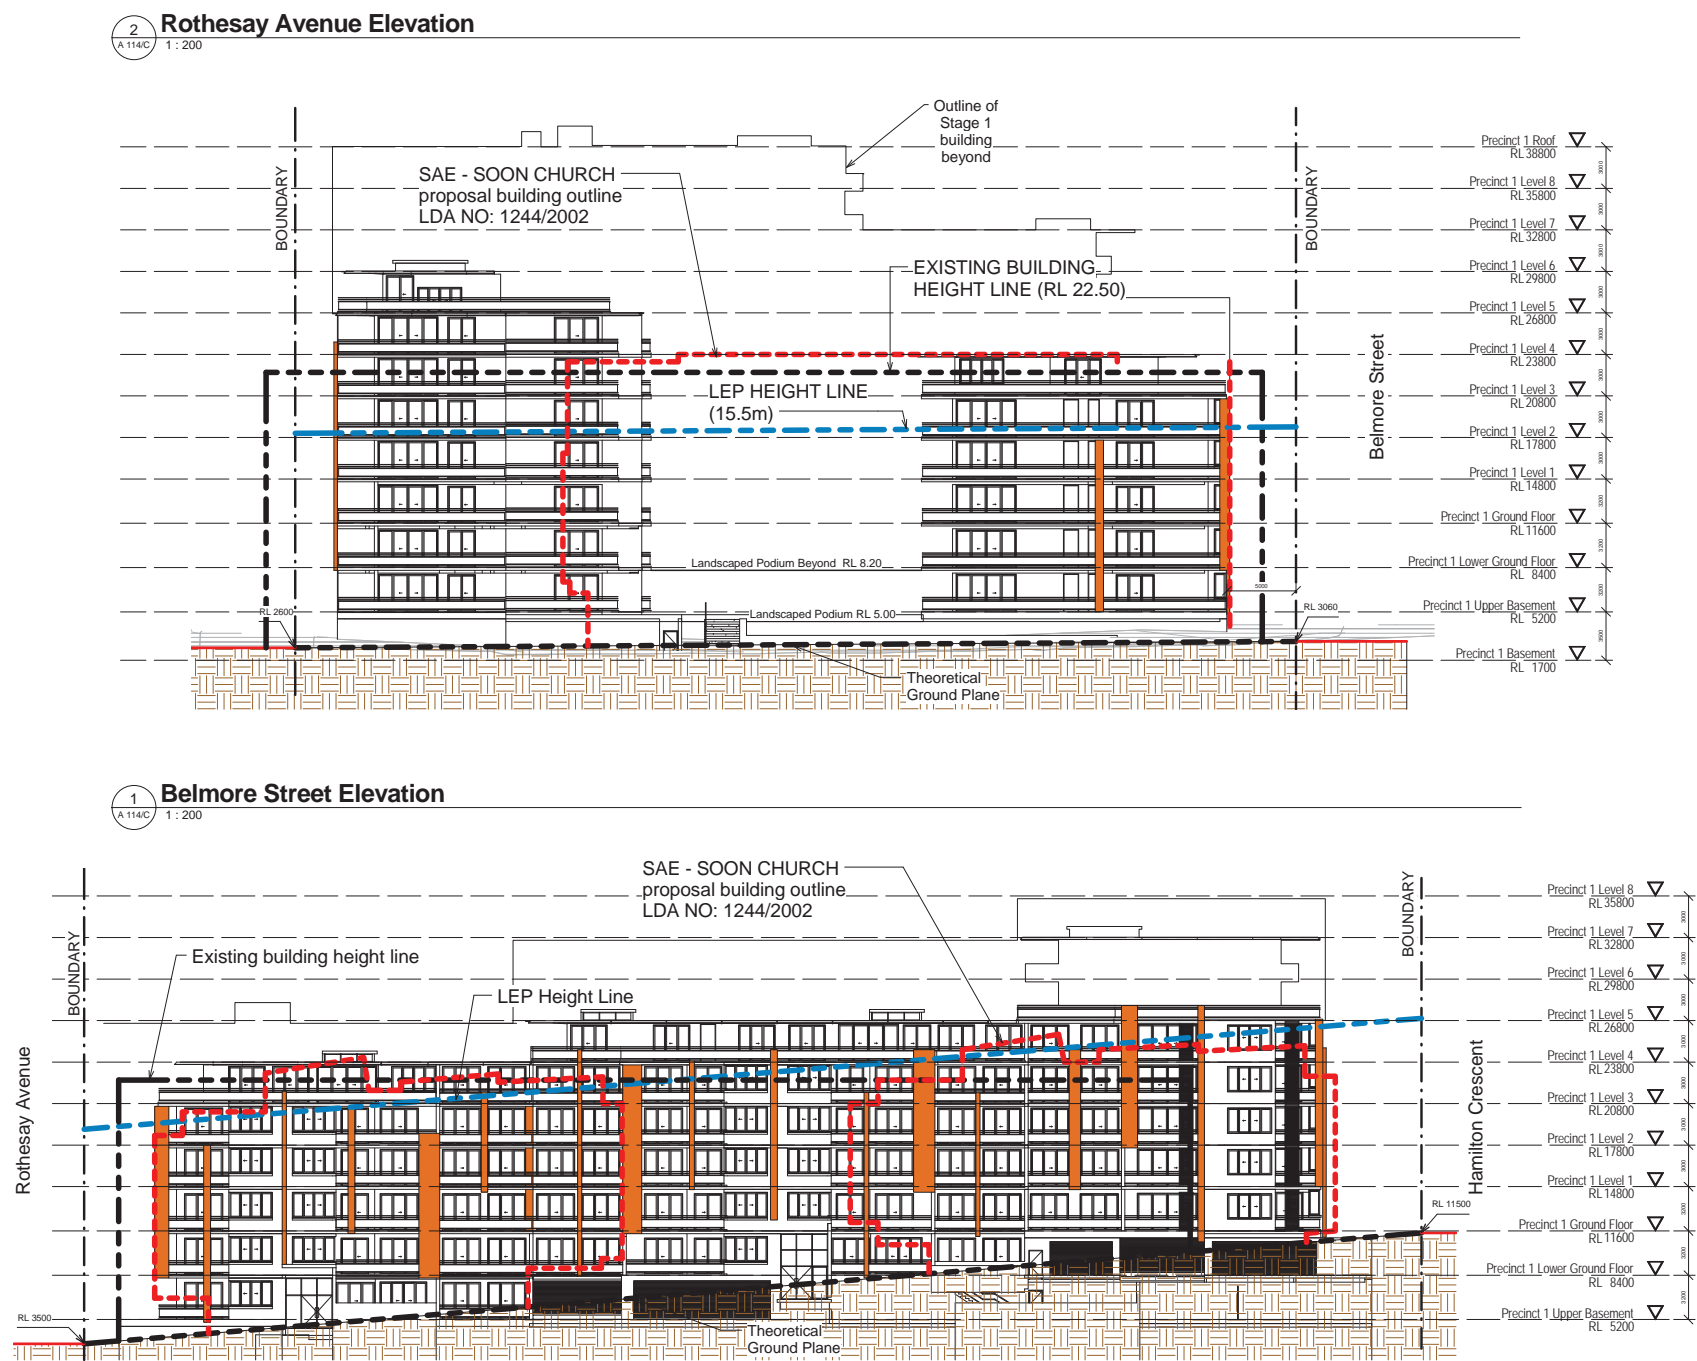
ROTHESAY AVENUE AND BELMORE STREET ELEVATIONS
